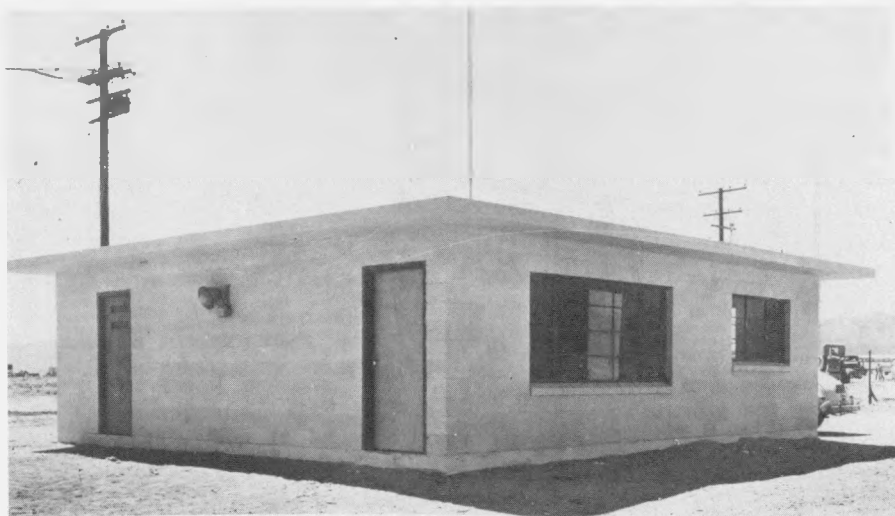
Reinforced masonry-block house before a nuclear explosion, Nevada Test Site.
